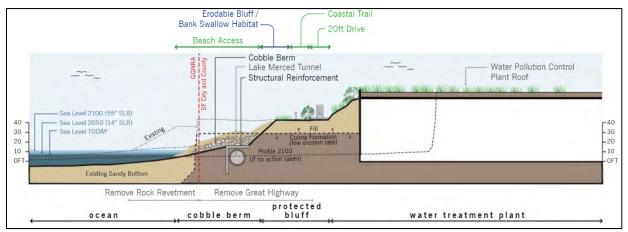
Summary of 2012 Master Plan Recommendations at Oceanside Water Pollution Control Plant.
